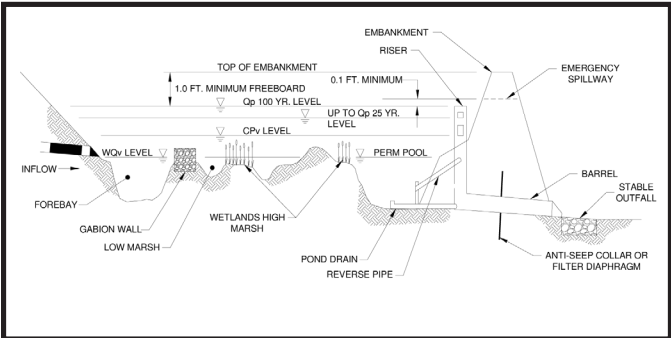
Constructed stormwater wetland. Source: Center for Watershed Protection
